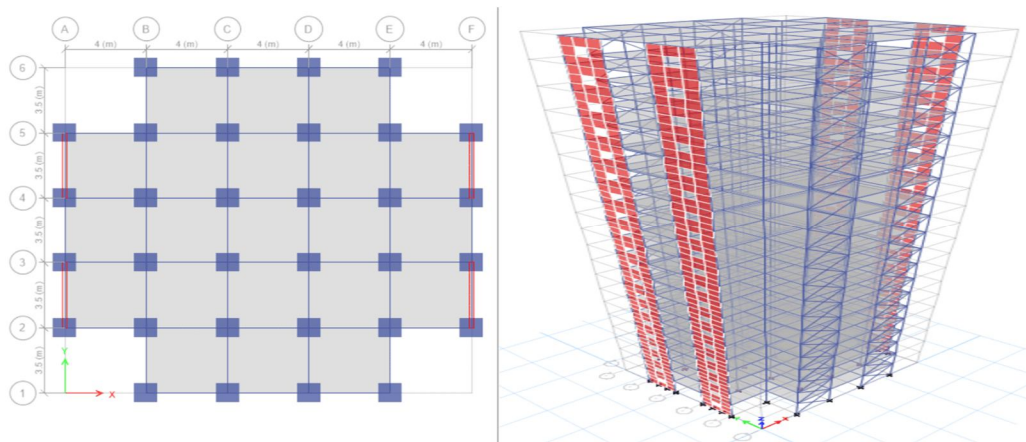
Plan and 3D view of Irregular building with shear walls and bracings on two opposite sides
